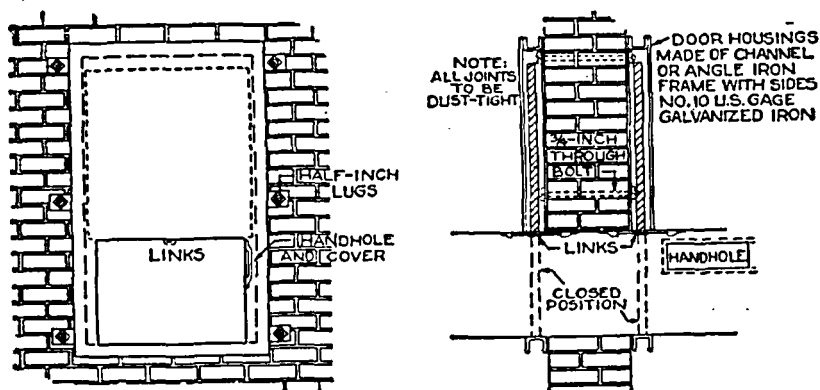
Suggested type of vertical fire door for duct passing through opening in fire wall.
